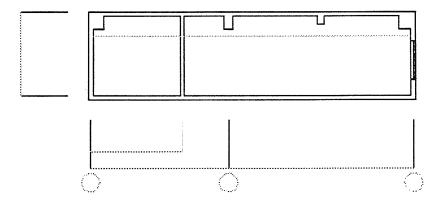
Simplified Section Drawing. AutoMOD interpretes walls, windows, girders, beams and slabs in a section drawing. Light color lines are ignored in interpretation.
